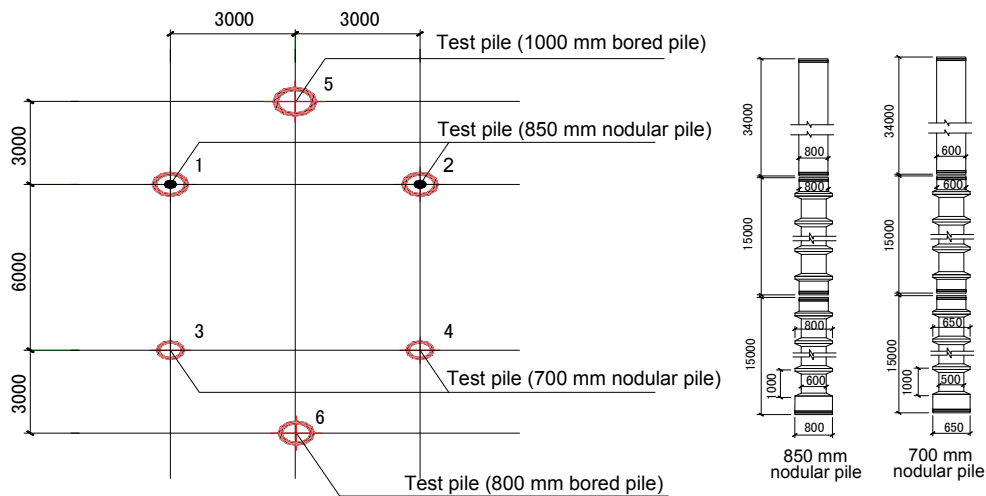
Sketch of test piles and layout of six piles in this test (unit: mm)
